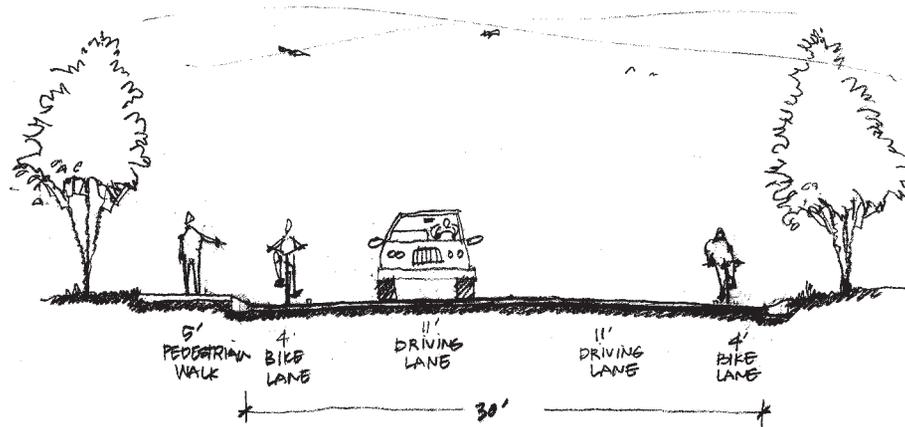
Skyline Parkway 30-foot roadway section. Example with bike lanes and sidewalk.
